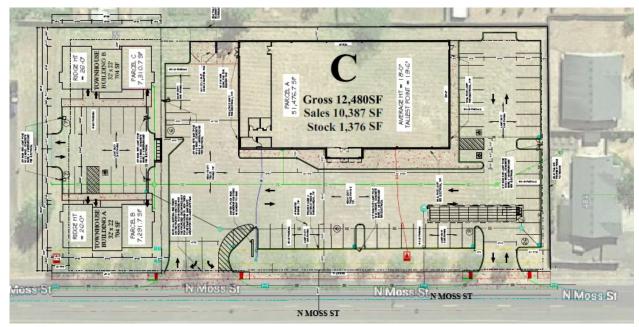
Proposed site plan for an eventual Dollar General retail store and six-unit multiple-family dwelling development. Site plan is not being reviewed at this time. Site plan included for context of overall project.
